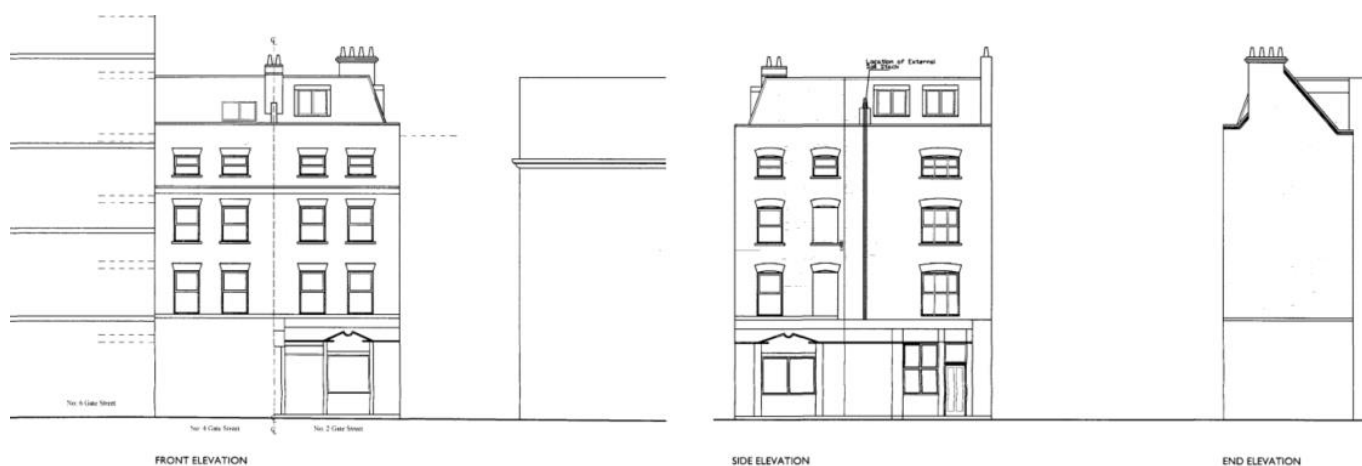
Proposed front, side and rear elevations of the refused scheme (ref 2006/5115/P).
